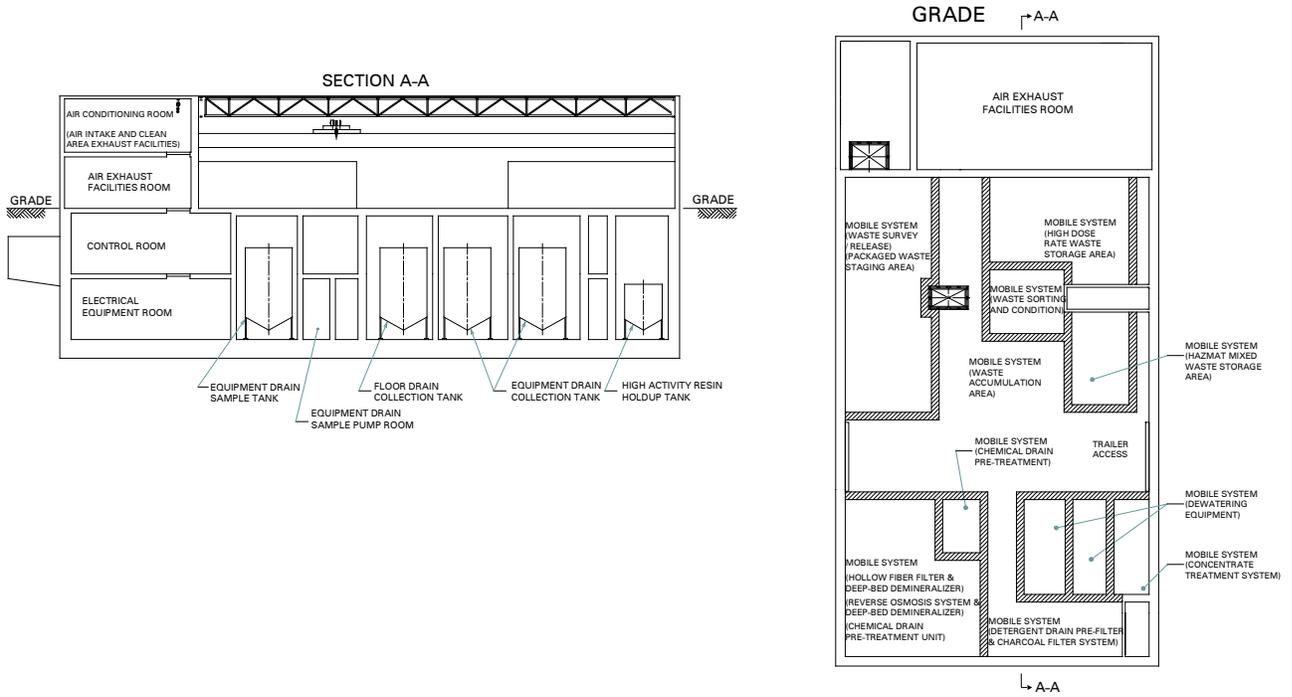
ESBWR Radwaste Building Section and Grade Elevation
